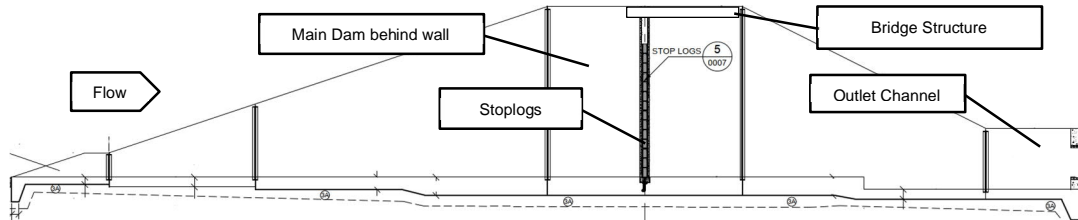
Elevation View Showing Section Through Concept of Overflow Spillway Structure
